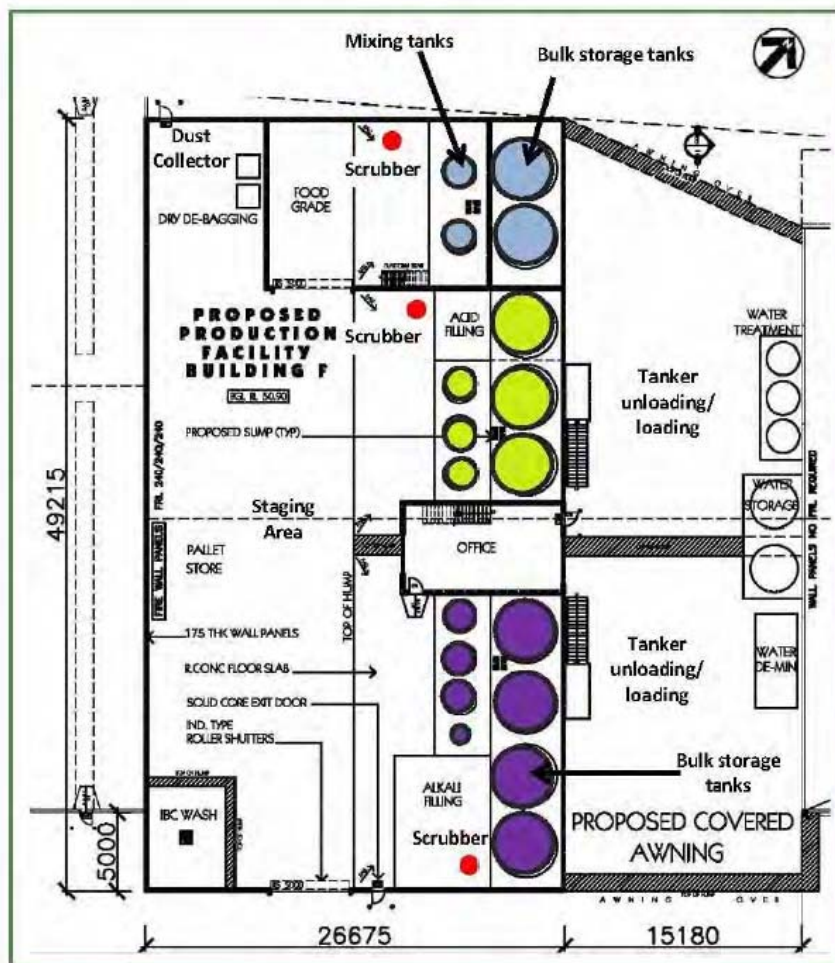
| Proposed Layout of the Stage 4 warehouse once constructed and operational
